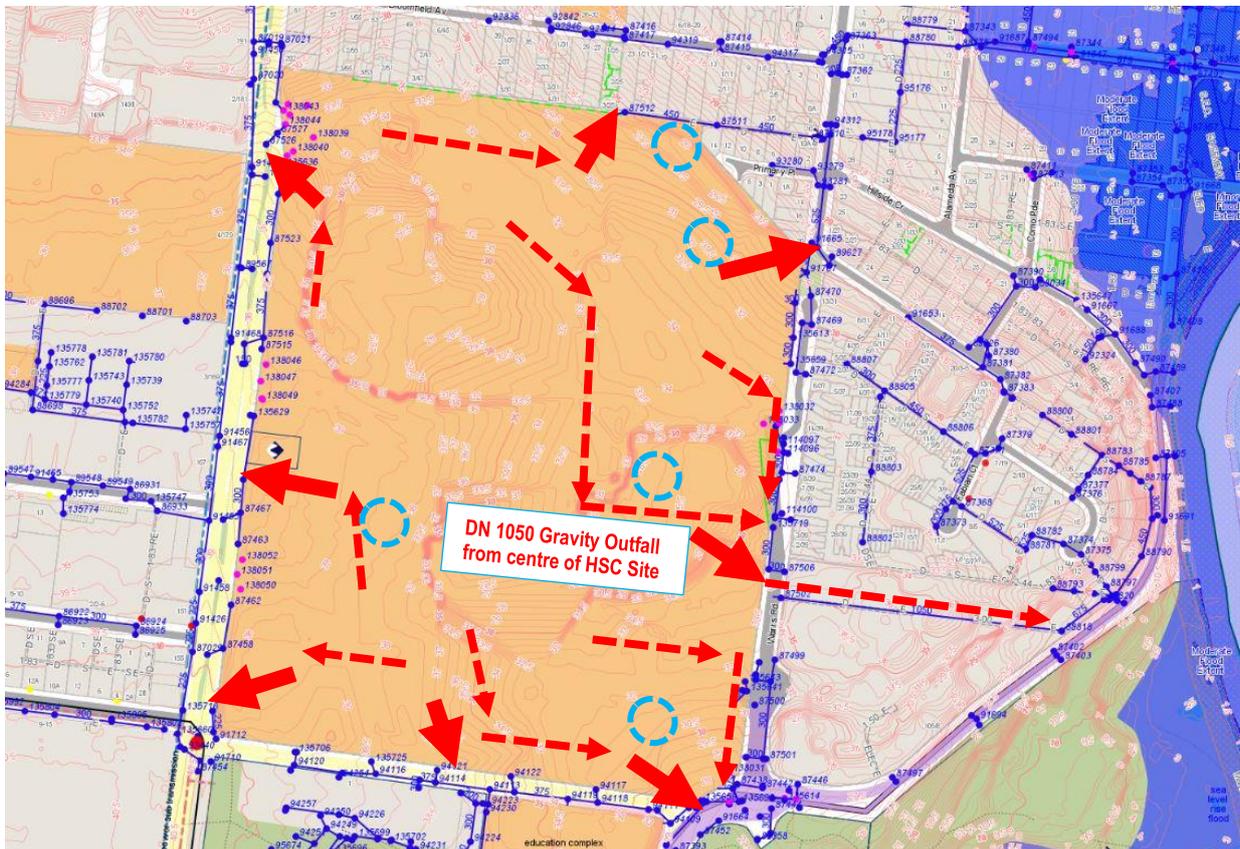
Overall Existing Stormwater – Proposed and existing Green space & Catchment outfalls
